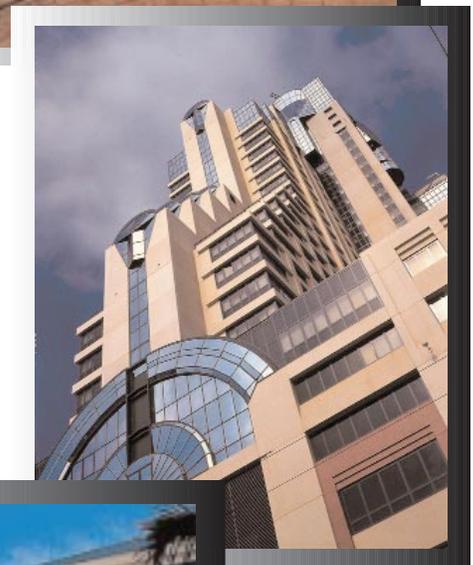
The San Francisco Marriott is built with precast panels made with white cement and a pink pigment. The upper floors are all glass fiber reinforced concrete. GFRC panels provide an attractive finish and are lightweight, strong, and durable. Architect: Zeidler Roberts Partnership, Toronto Canada. Photographer: Peter Leach, Denver, Pennsylvania.
